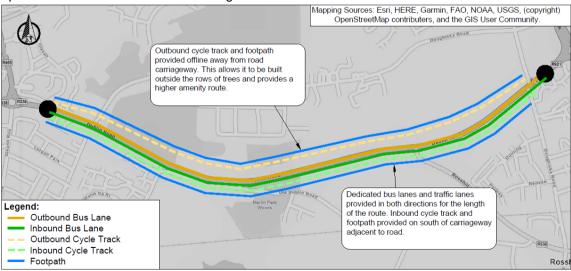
Section 2 Option 3 Indicative Scheme Design
